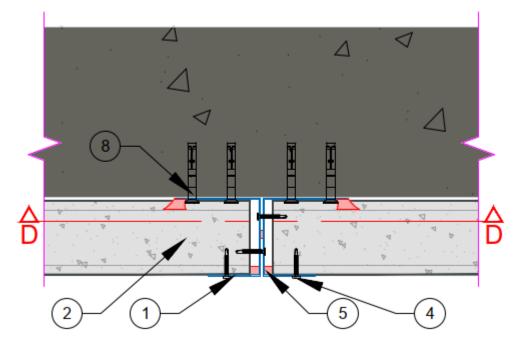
Single void box riser – mid-wall connection when span is 6 m (connection to stringer)
